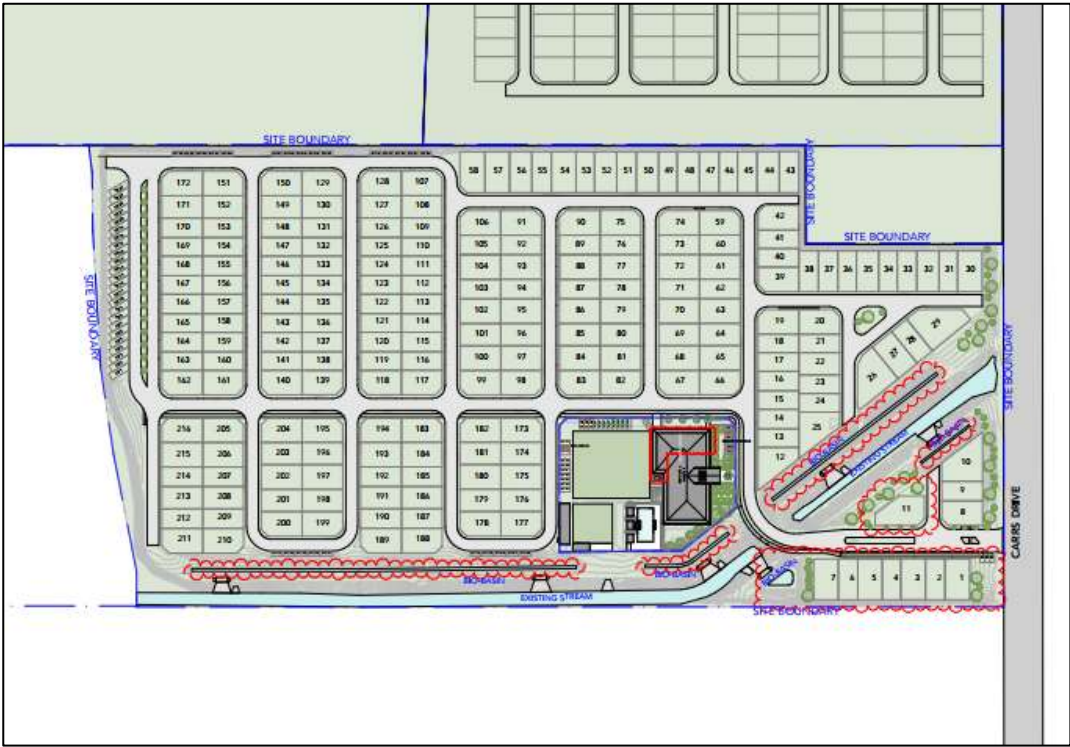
Proposed Plan (Source: Mark Shapiro Architects)
